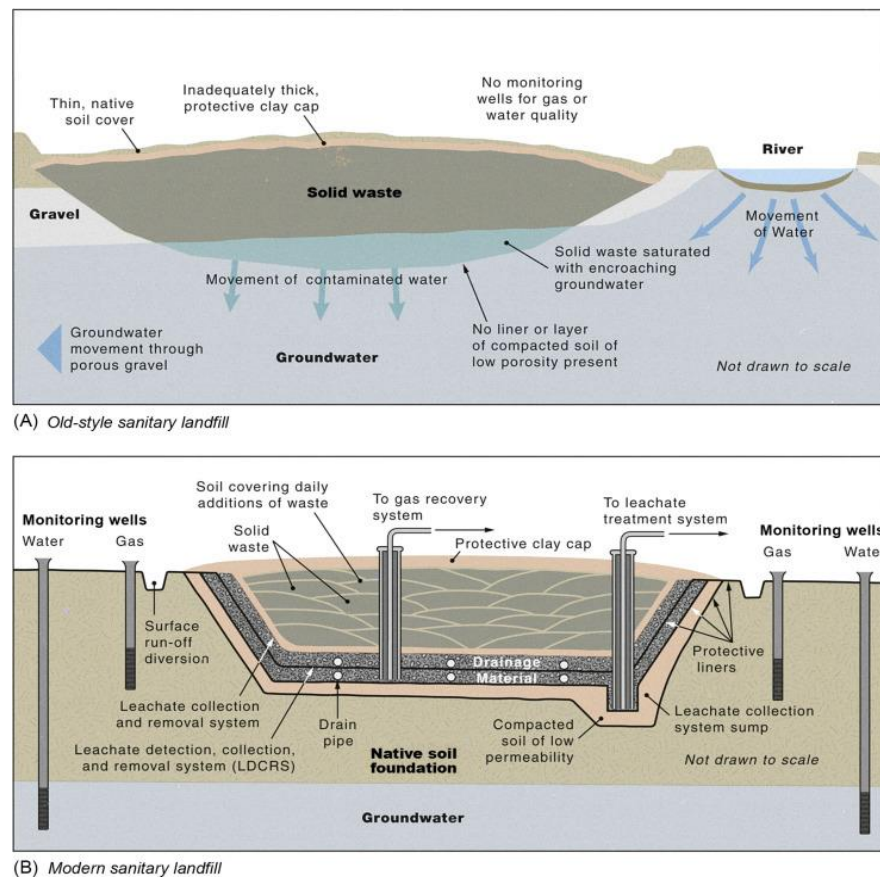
Difference between traditional landfill's plan and modern constructed landfill
